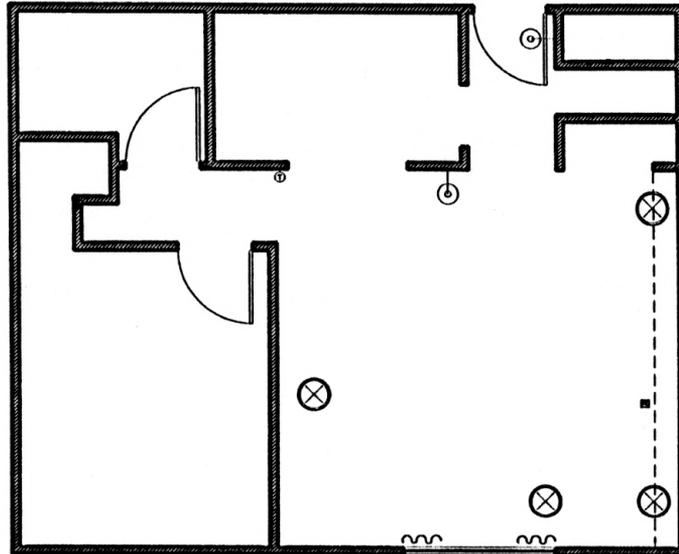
Plan of Independent Living Apartment - Site 3.
